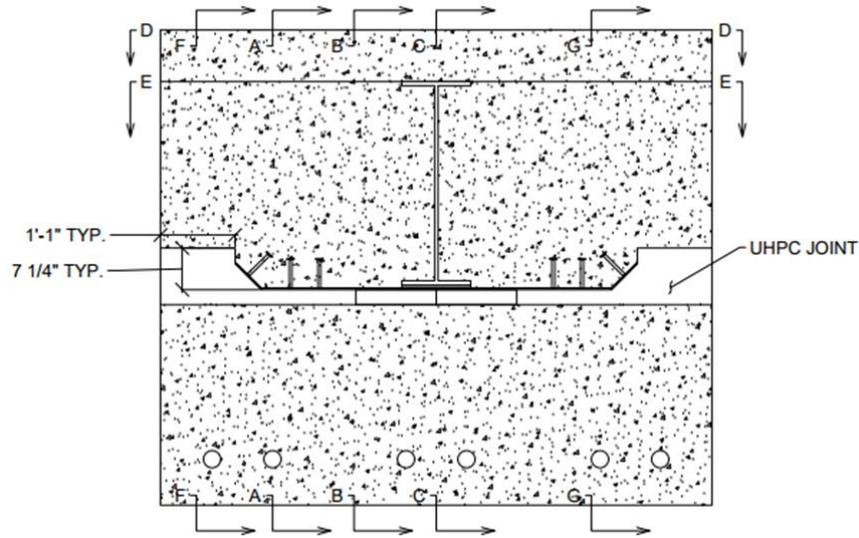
UHPC joint specimen front view showing “sliding shoes” and pads
